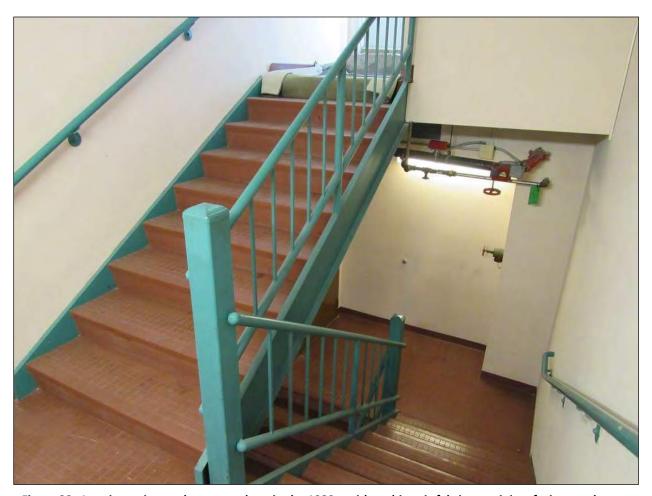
Interior staircase that was redone in the 1980s, with no historic fabric remaining, facing southwest.
